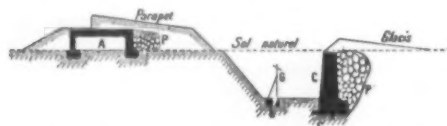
SECTION OF PARAPET AND DITCH OF A MODERN FORT.
